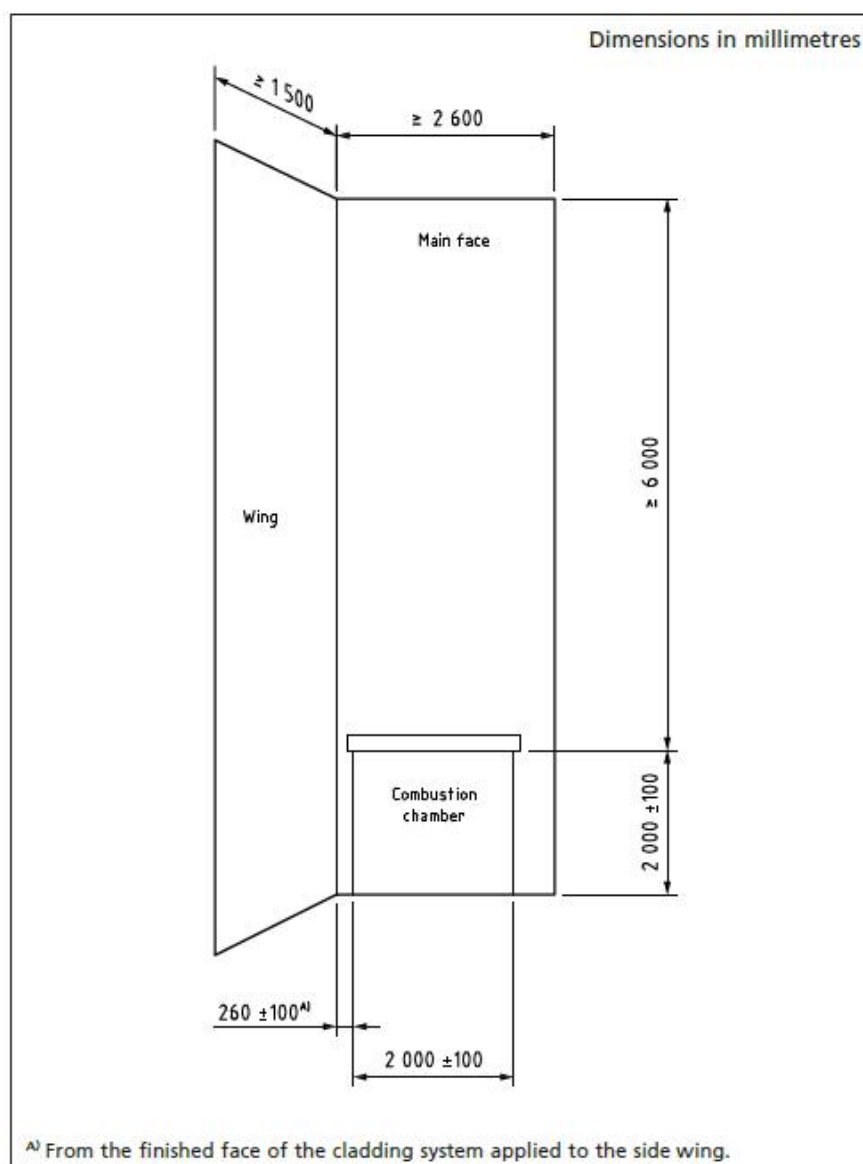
Test apparatus dimensions as specified by test Standard<sup>[1]</sup>.
